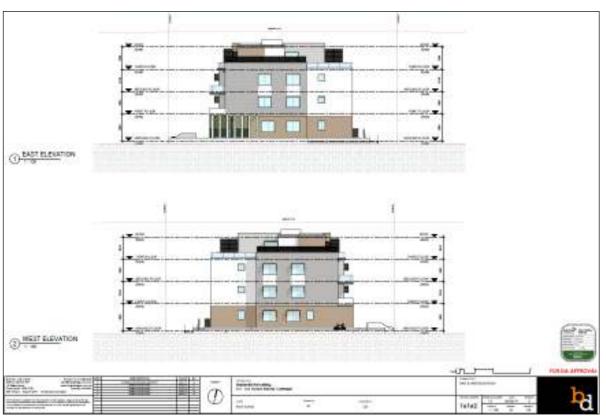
View of the East and West Elevations of the Proposal (source: 16162-13 Rev E prepared by Baini Design).
